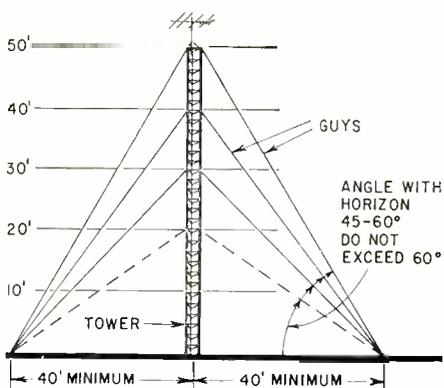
Side view of guy wires on 50-foot tower. Often, first 20 feet can be braced against building.
